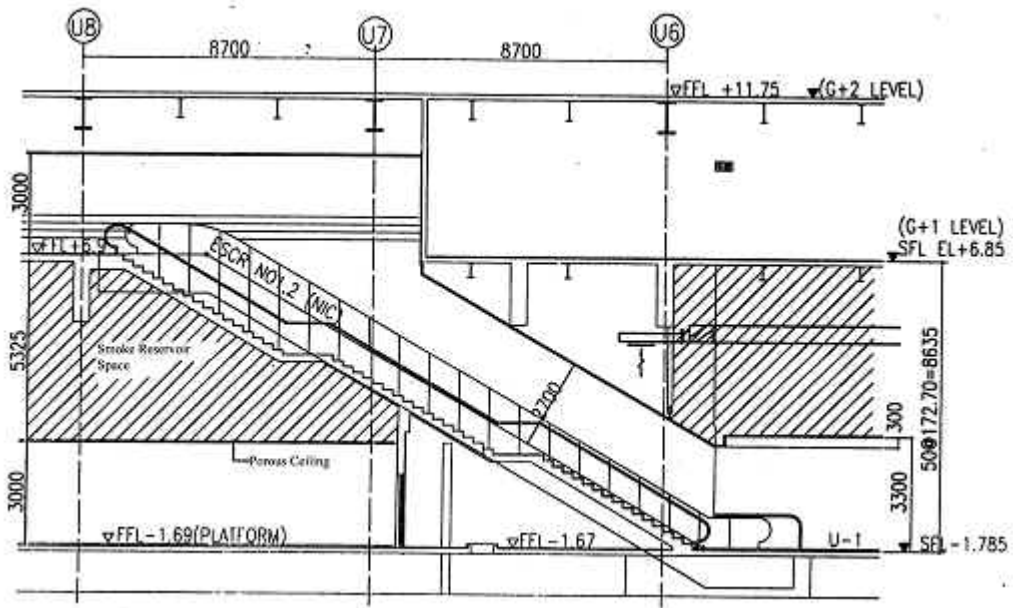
A Cross-sectional view of the Wan-hwa underground station
